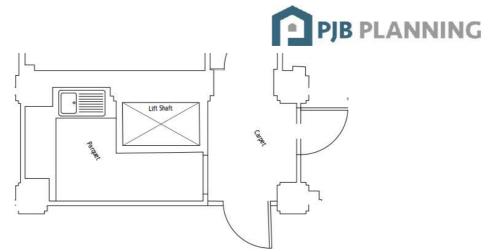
Existing layout of kitchen/dumb waiter lift shaft and communal hallway
